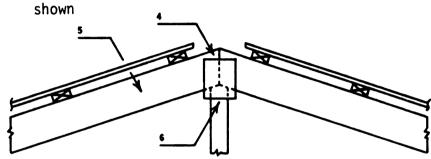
Location of test sites, Barn D. Truss No. 2, 31.6m (104') from west end. East elevation. Molded flashing not shown
